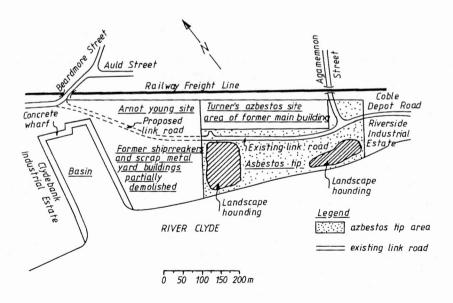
Arnott Young site and Turners asbestos site existing layout
